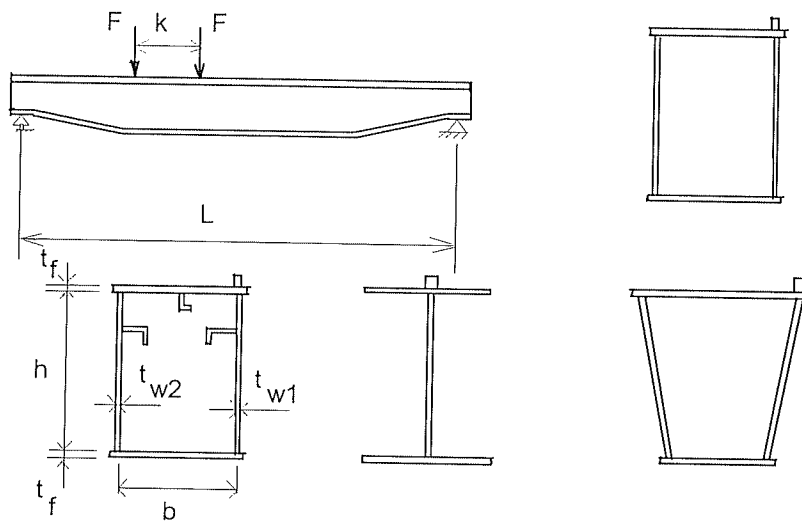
An overhead travelling crane and different cross sections of the main girder
